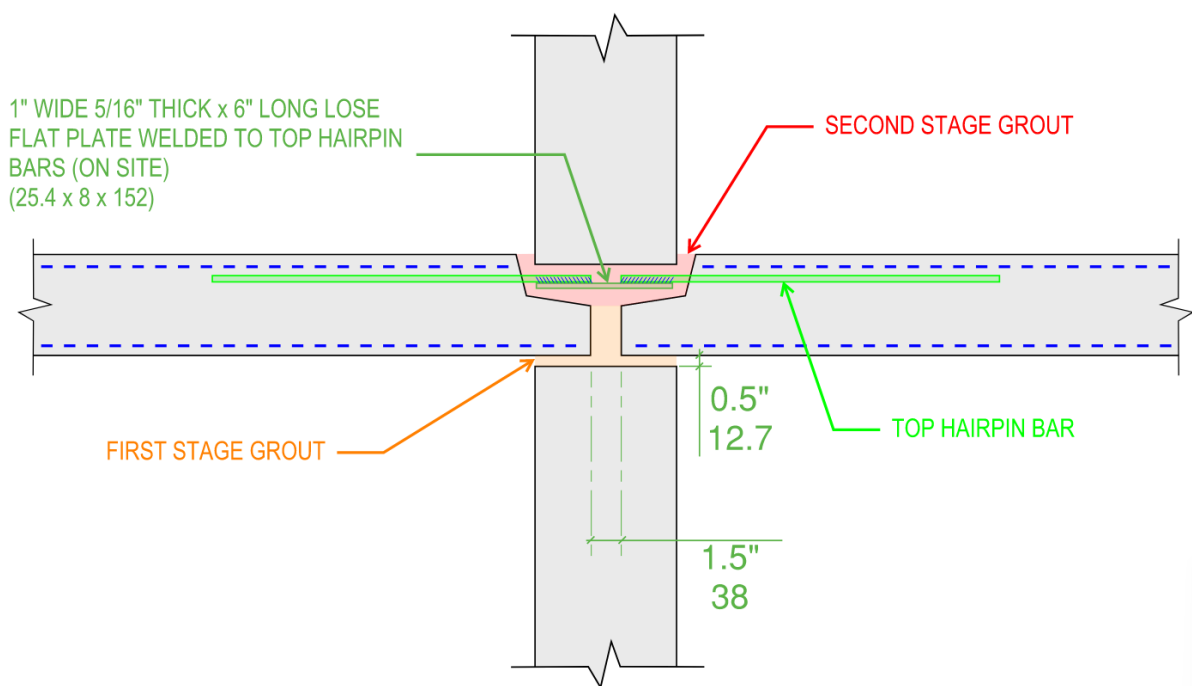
Typical Panel to load-bearing wall junction cross-section.
